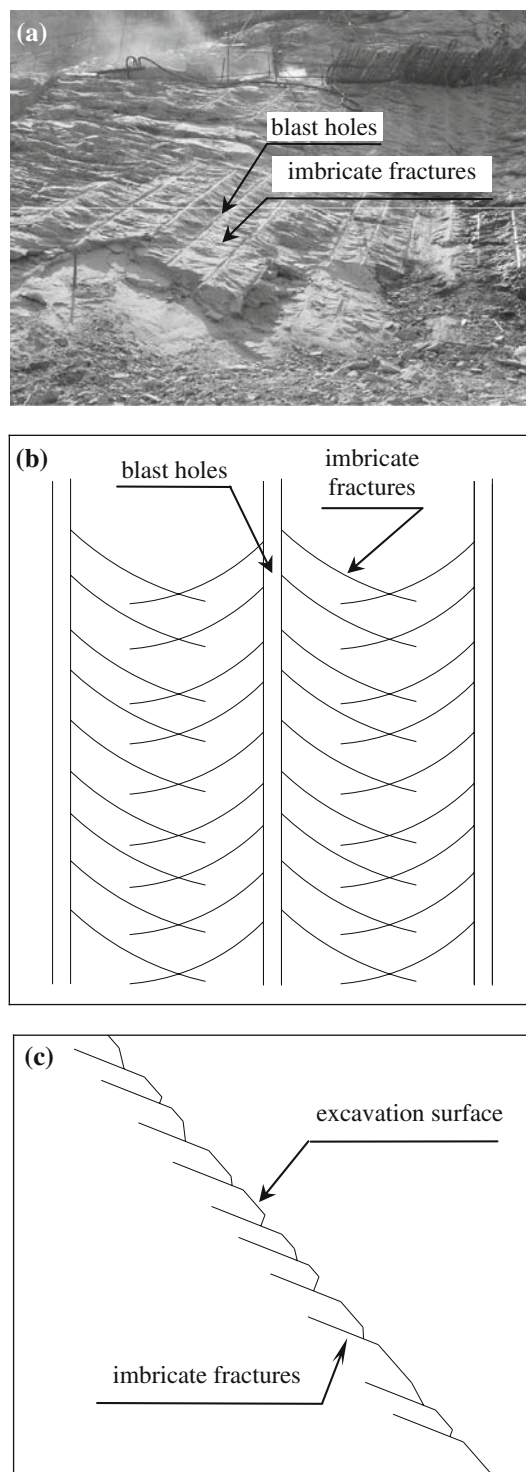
Imbricate fractures. a Photo of the imbricate fractures. b Plan sketch of the imbricate fractures c Section sketch of the imbricate fractures (along direction of the blast bores)
